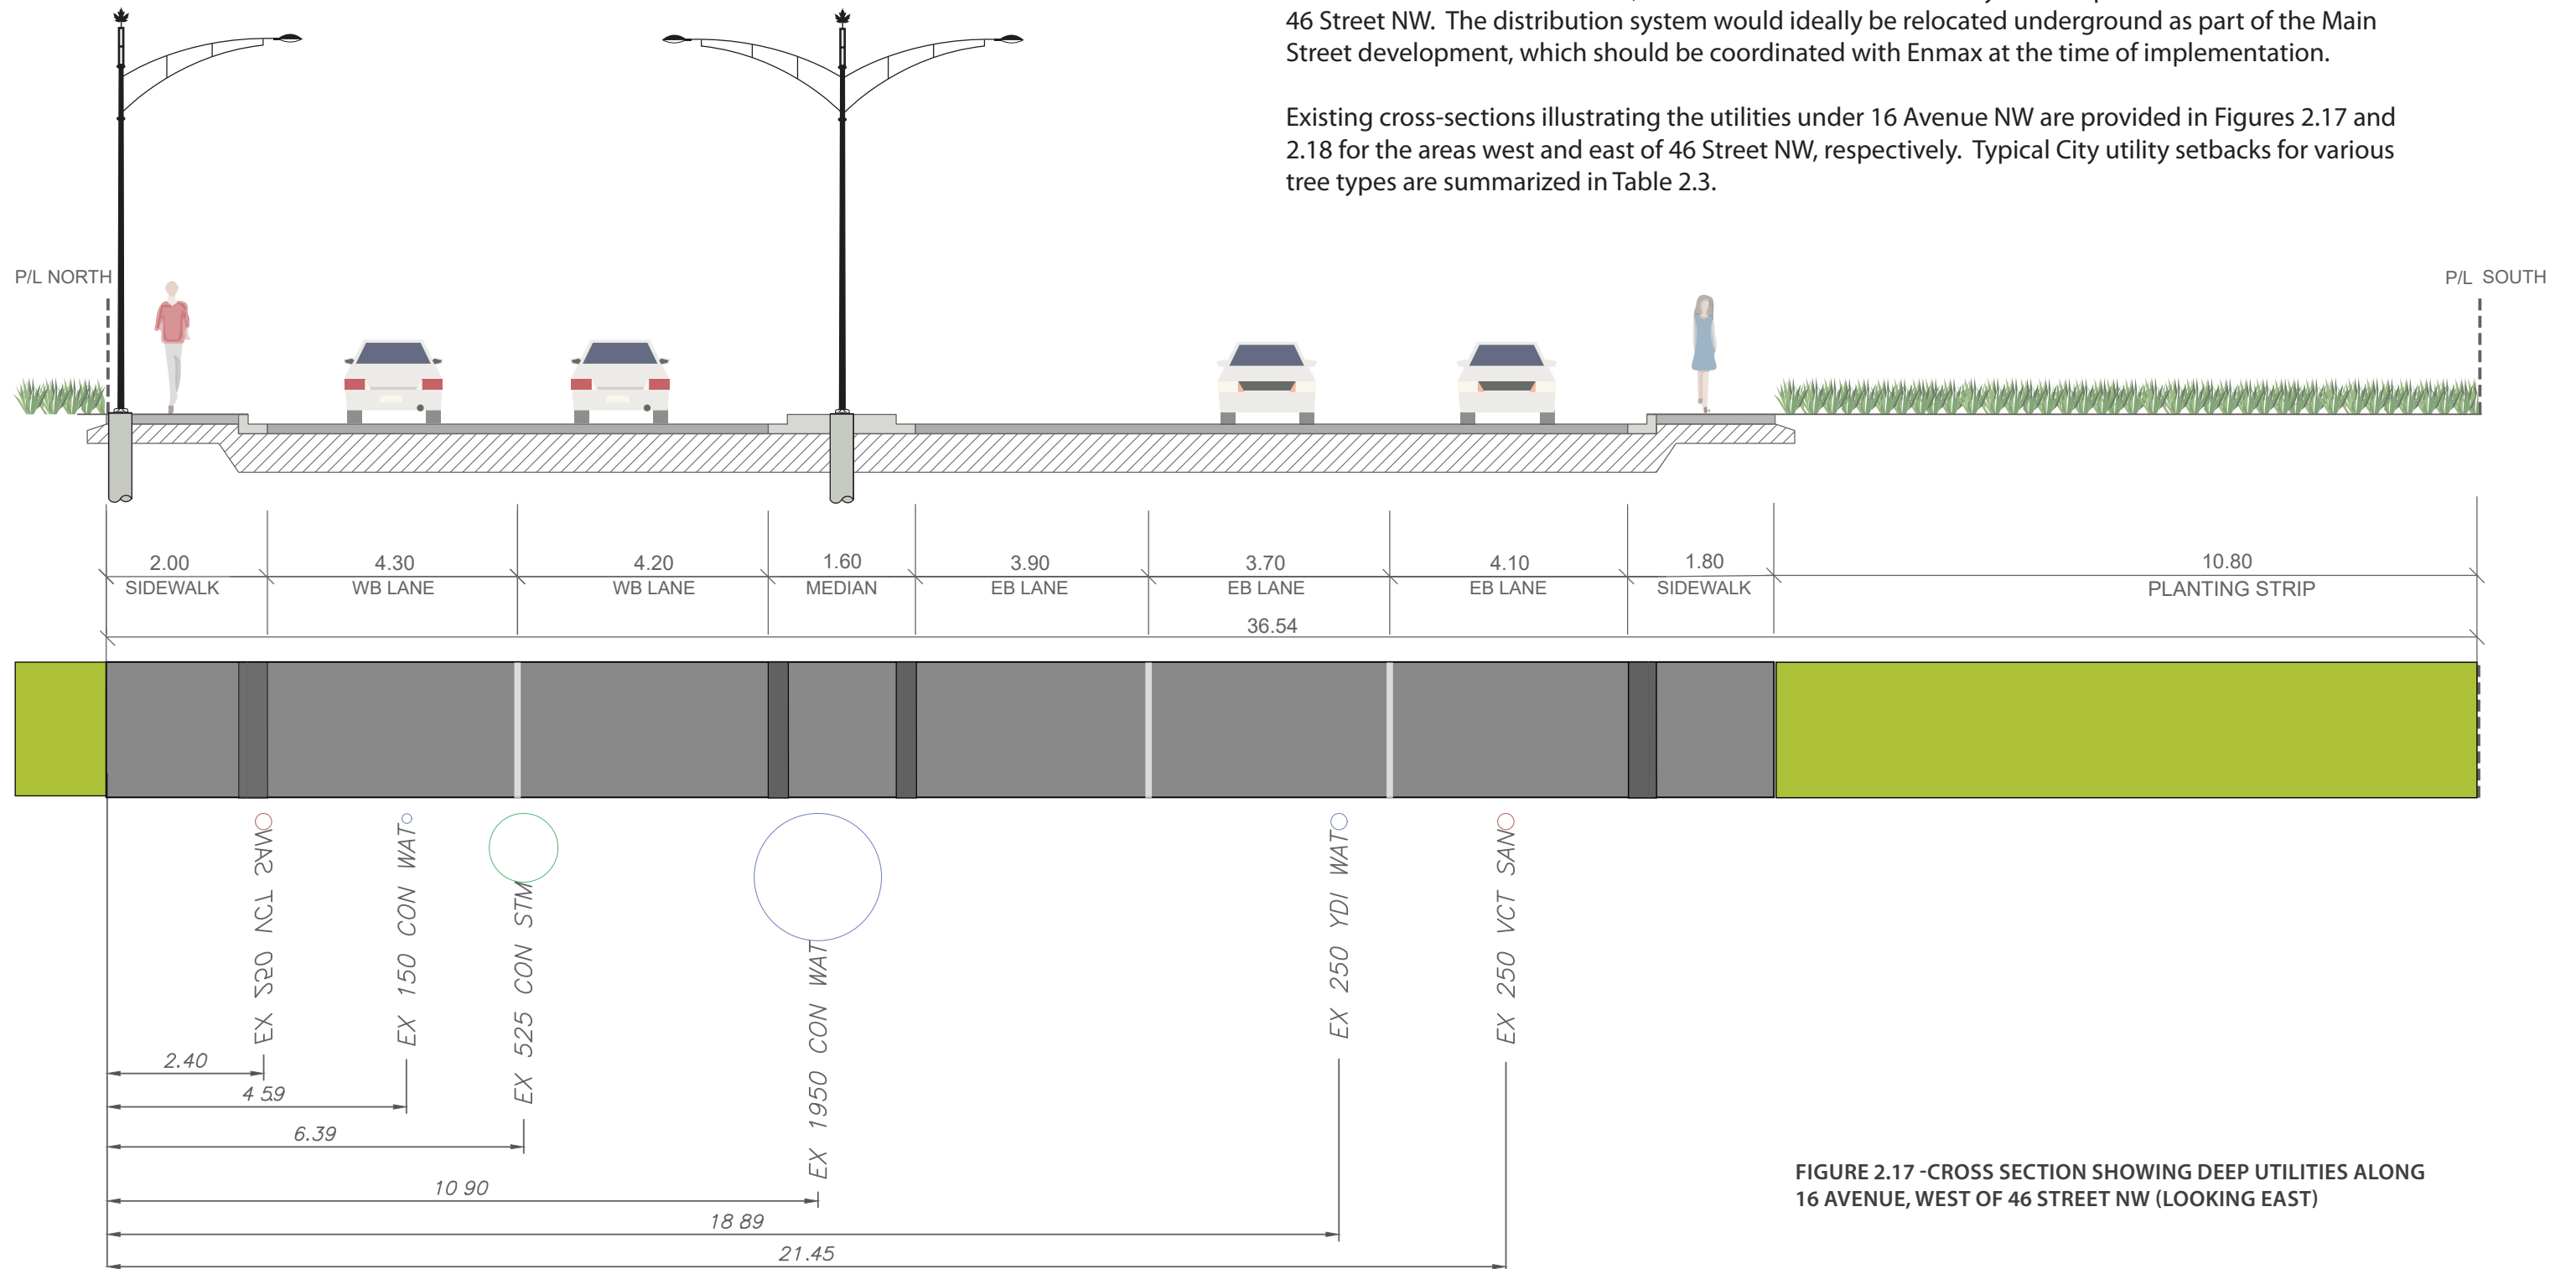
CROSS SECTION SHOWING DEEP UTILITIES ALONG 16 AVENUE, WEST OF 46 STREET NW (LOOKING EAST)
